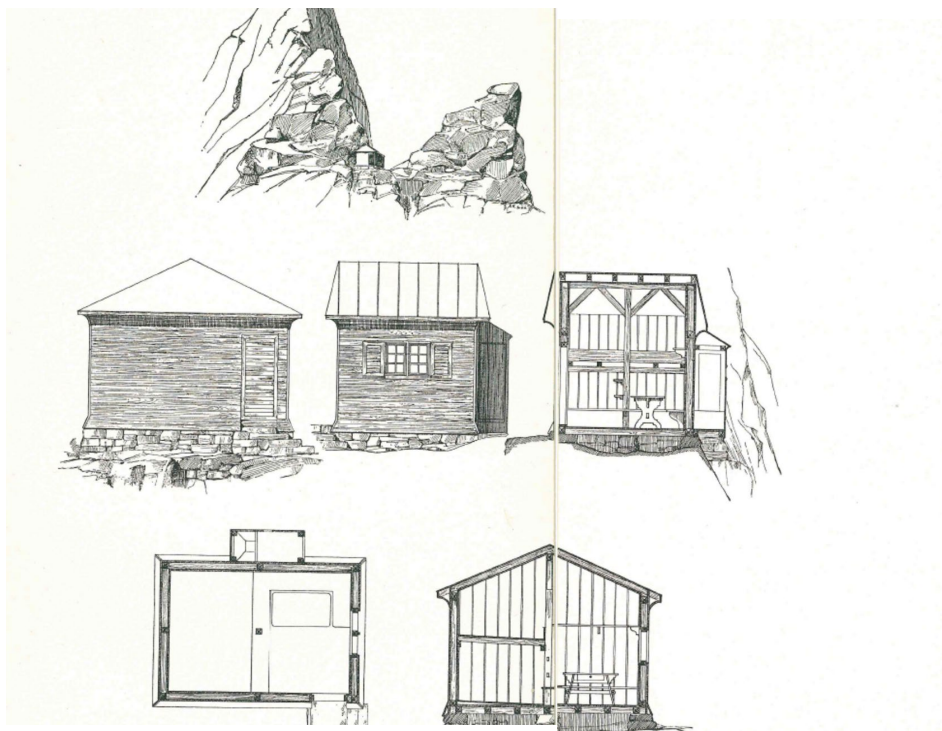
(Kalbermatten Architects Archives, 1915).- *Refuge Solvay at the Cervin (4000m)*, Plan , sections and elevations
